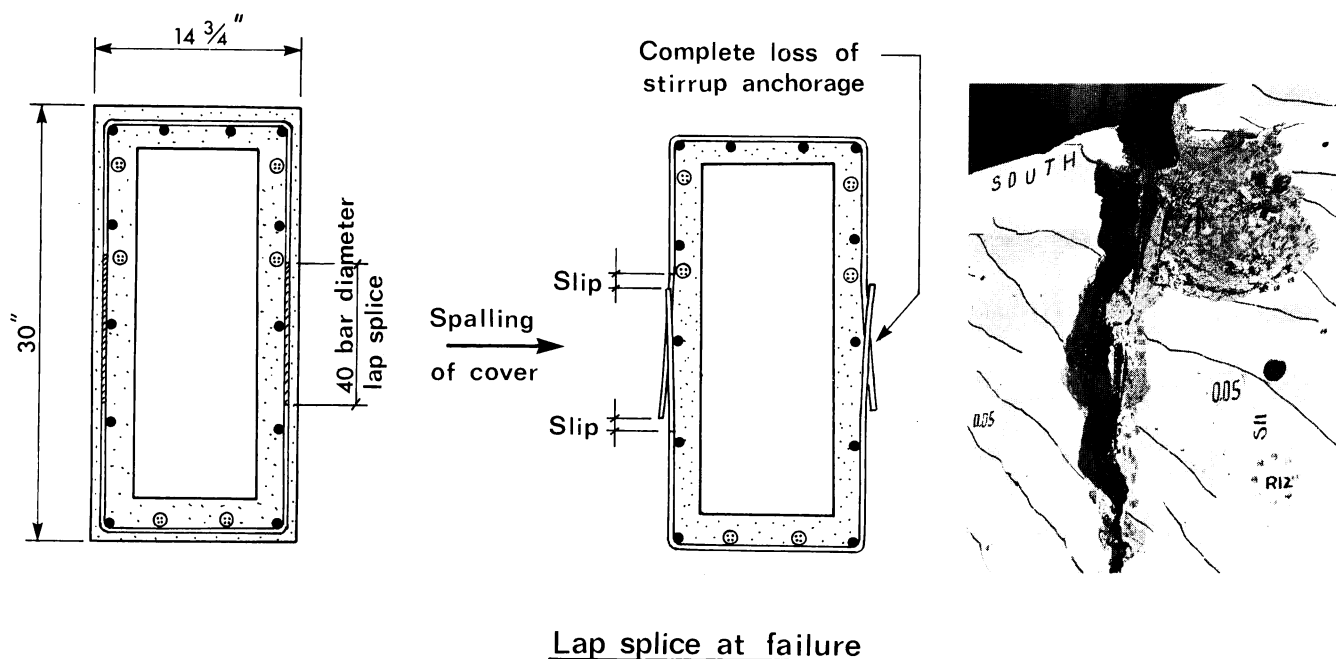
Lap splice failure of a beam tested in torsion at the University of Toronto. (1 in. = 2.54 cm)
